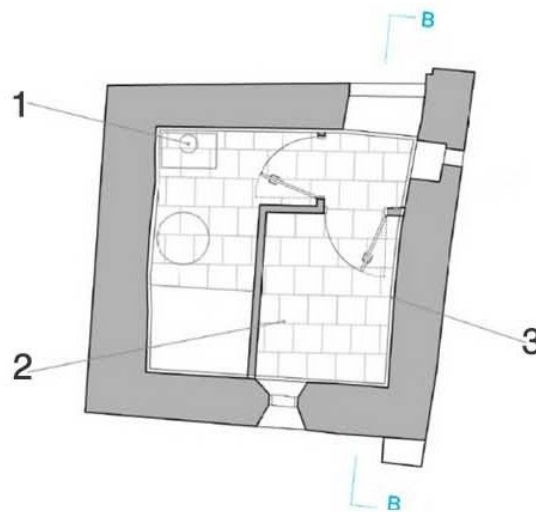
Casa Dell'affresco Detail of the works planned on the ground floor, (FoRTI, 2023)
